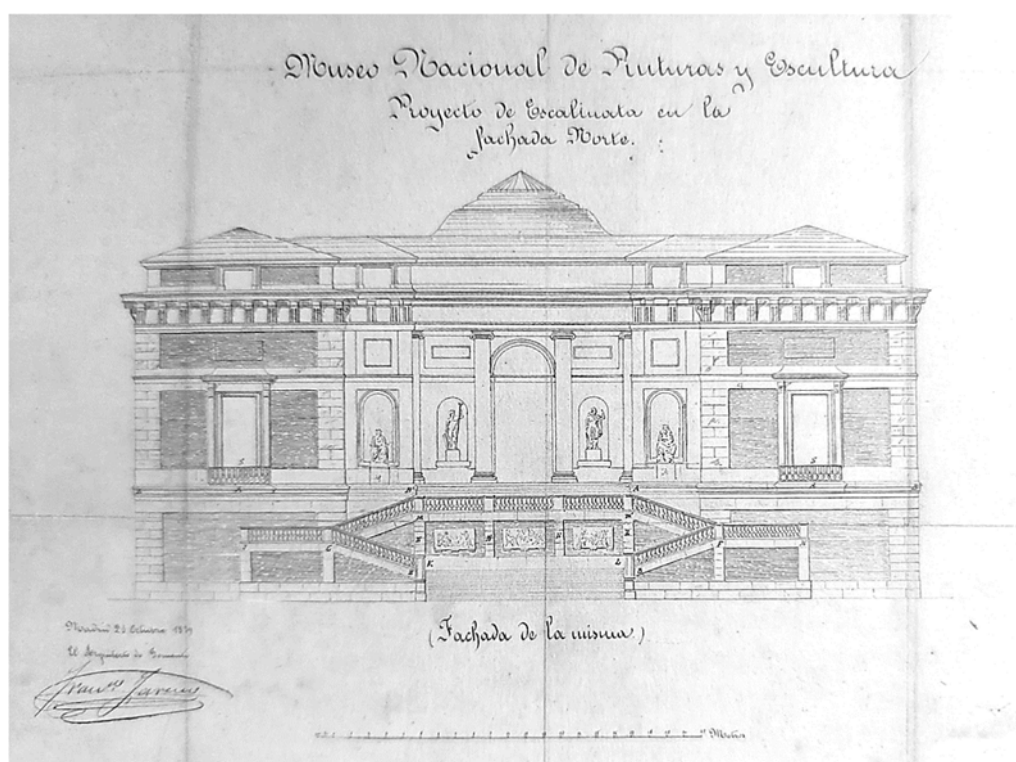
Project for the stairs of the North façade (1879, F. Jareño).
